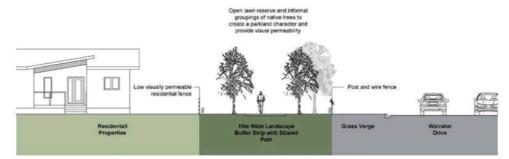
C: Cross section illustrating the 10m wide Landscape Buffer Strip with Shared Path to the Wairakei Drive road frontage design
